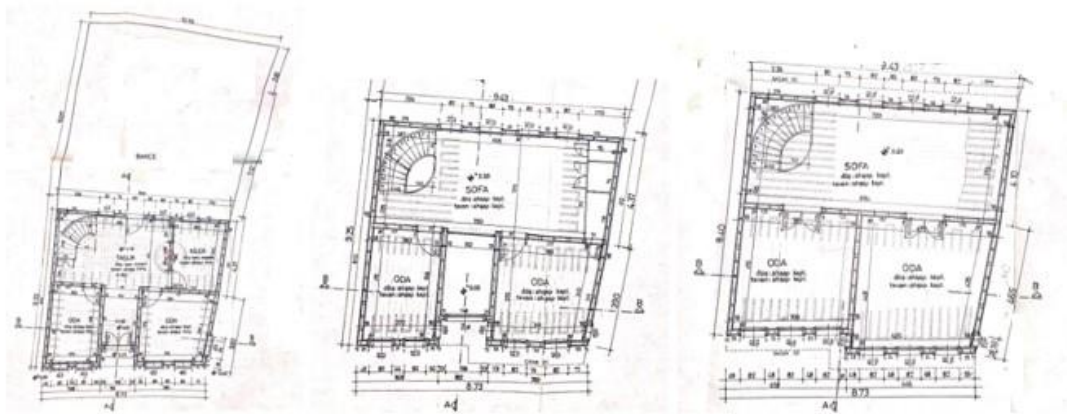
Basement and 1 and 2 floors plan of parcel number 9 (Scale:1/50)
